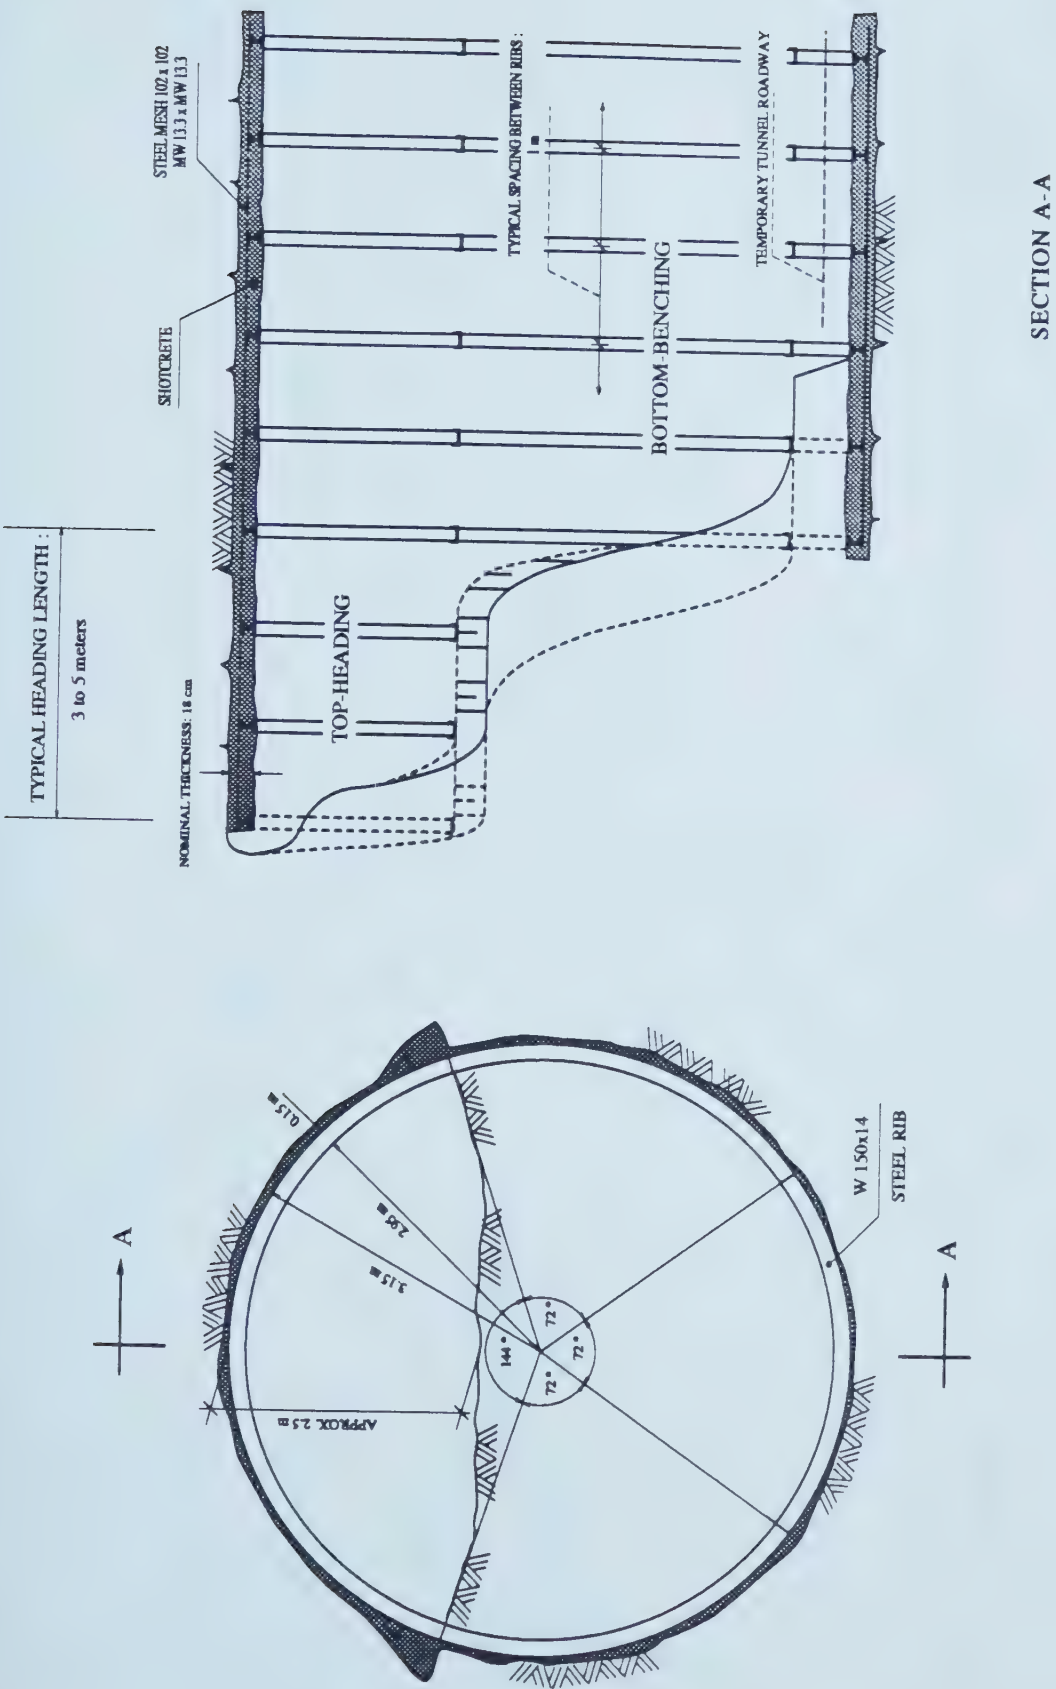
Typical Scheme for Excavation of NATM Tunnels
